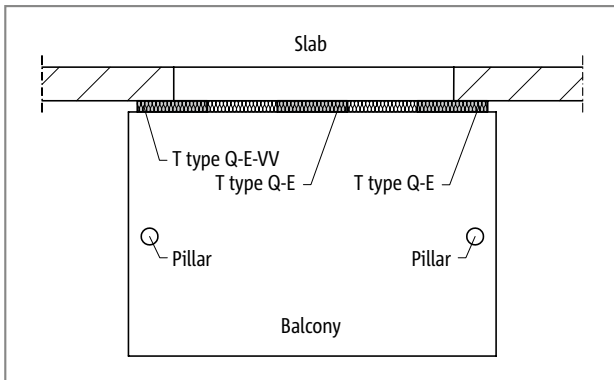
Schöck Isokorb® T type Q-E, Q-E-VV: Balcony with pillar support
